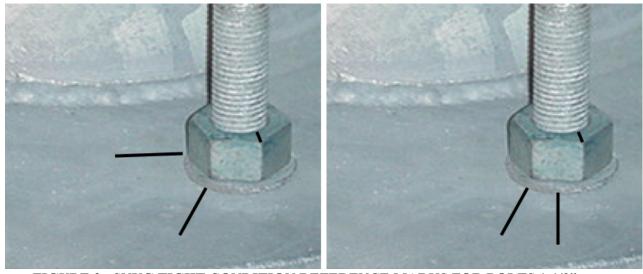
SNUG TIGHT CONDITION REFERENCE MARKS FOR BOLTS 1-1/2" DIAMETER OR LESS (LEFT) AND BOLTS GREATER THAN 1-1/2" DIAMETER (RIGHT)
